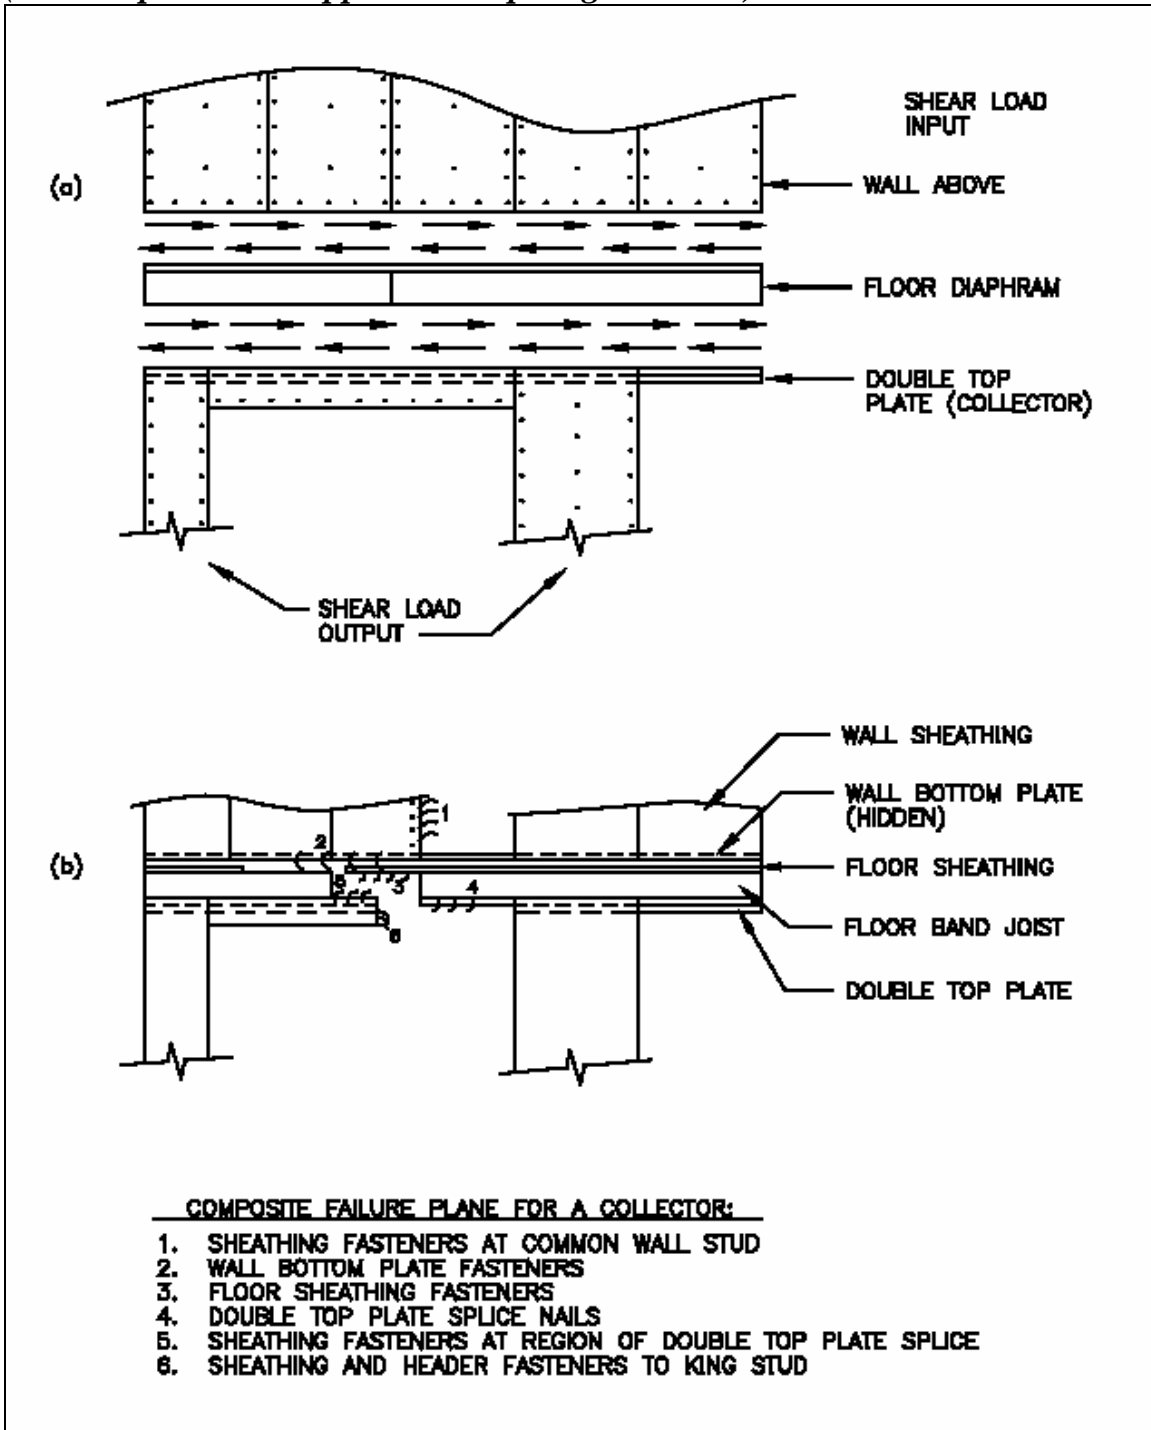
Shear Wall Collector and the Composite Failure Plane
